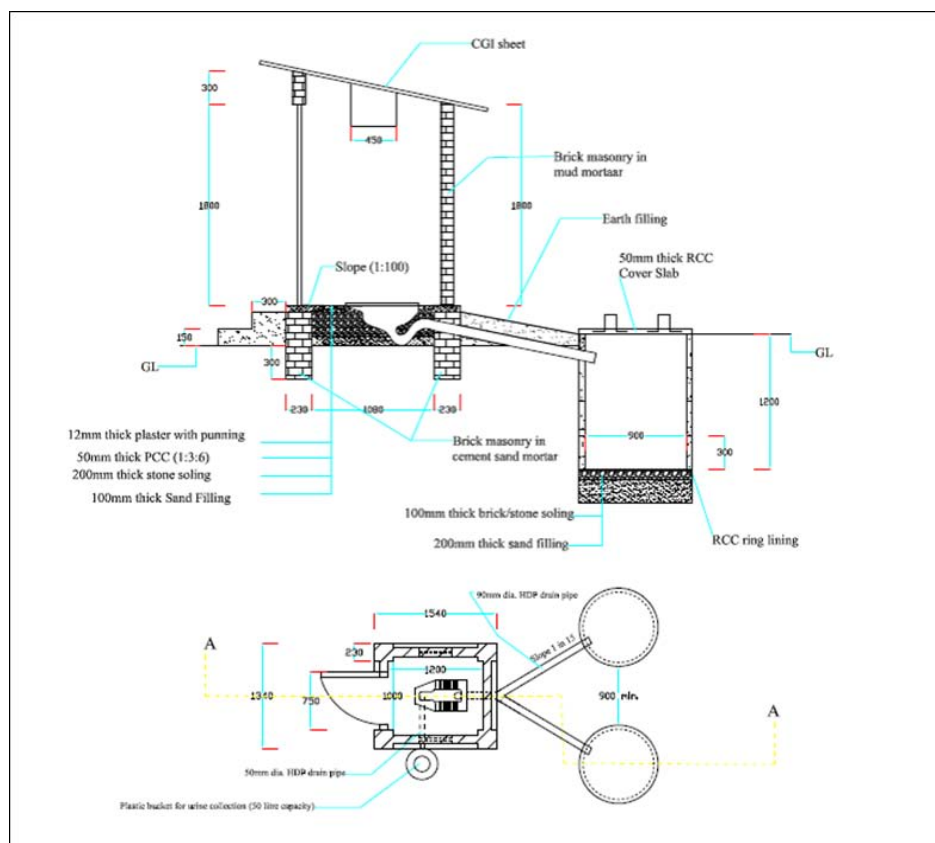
UDPF of pit RCC lining and plan (source: DWSS)
